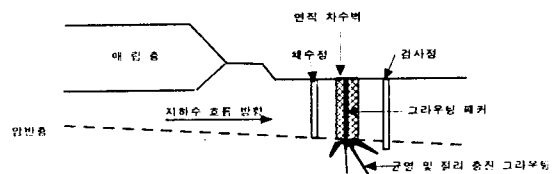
Typical Cross Section View of Deep Soil Mixing Cutoff Wall Adopted at the Field
